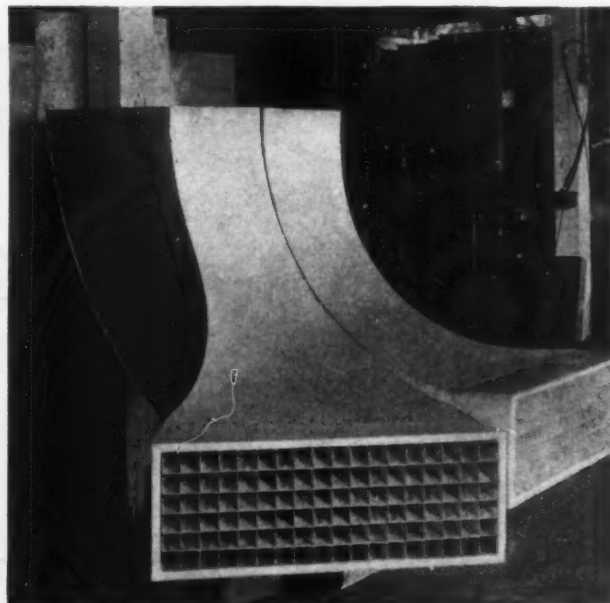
These double, 36 by 12-inch nozzles, handle velocities of 2,500 fpm without noise. The section is completely welded, including the face grille.
